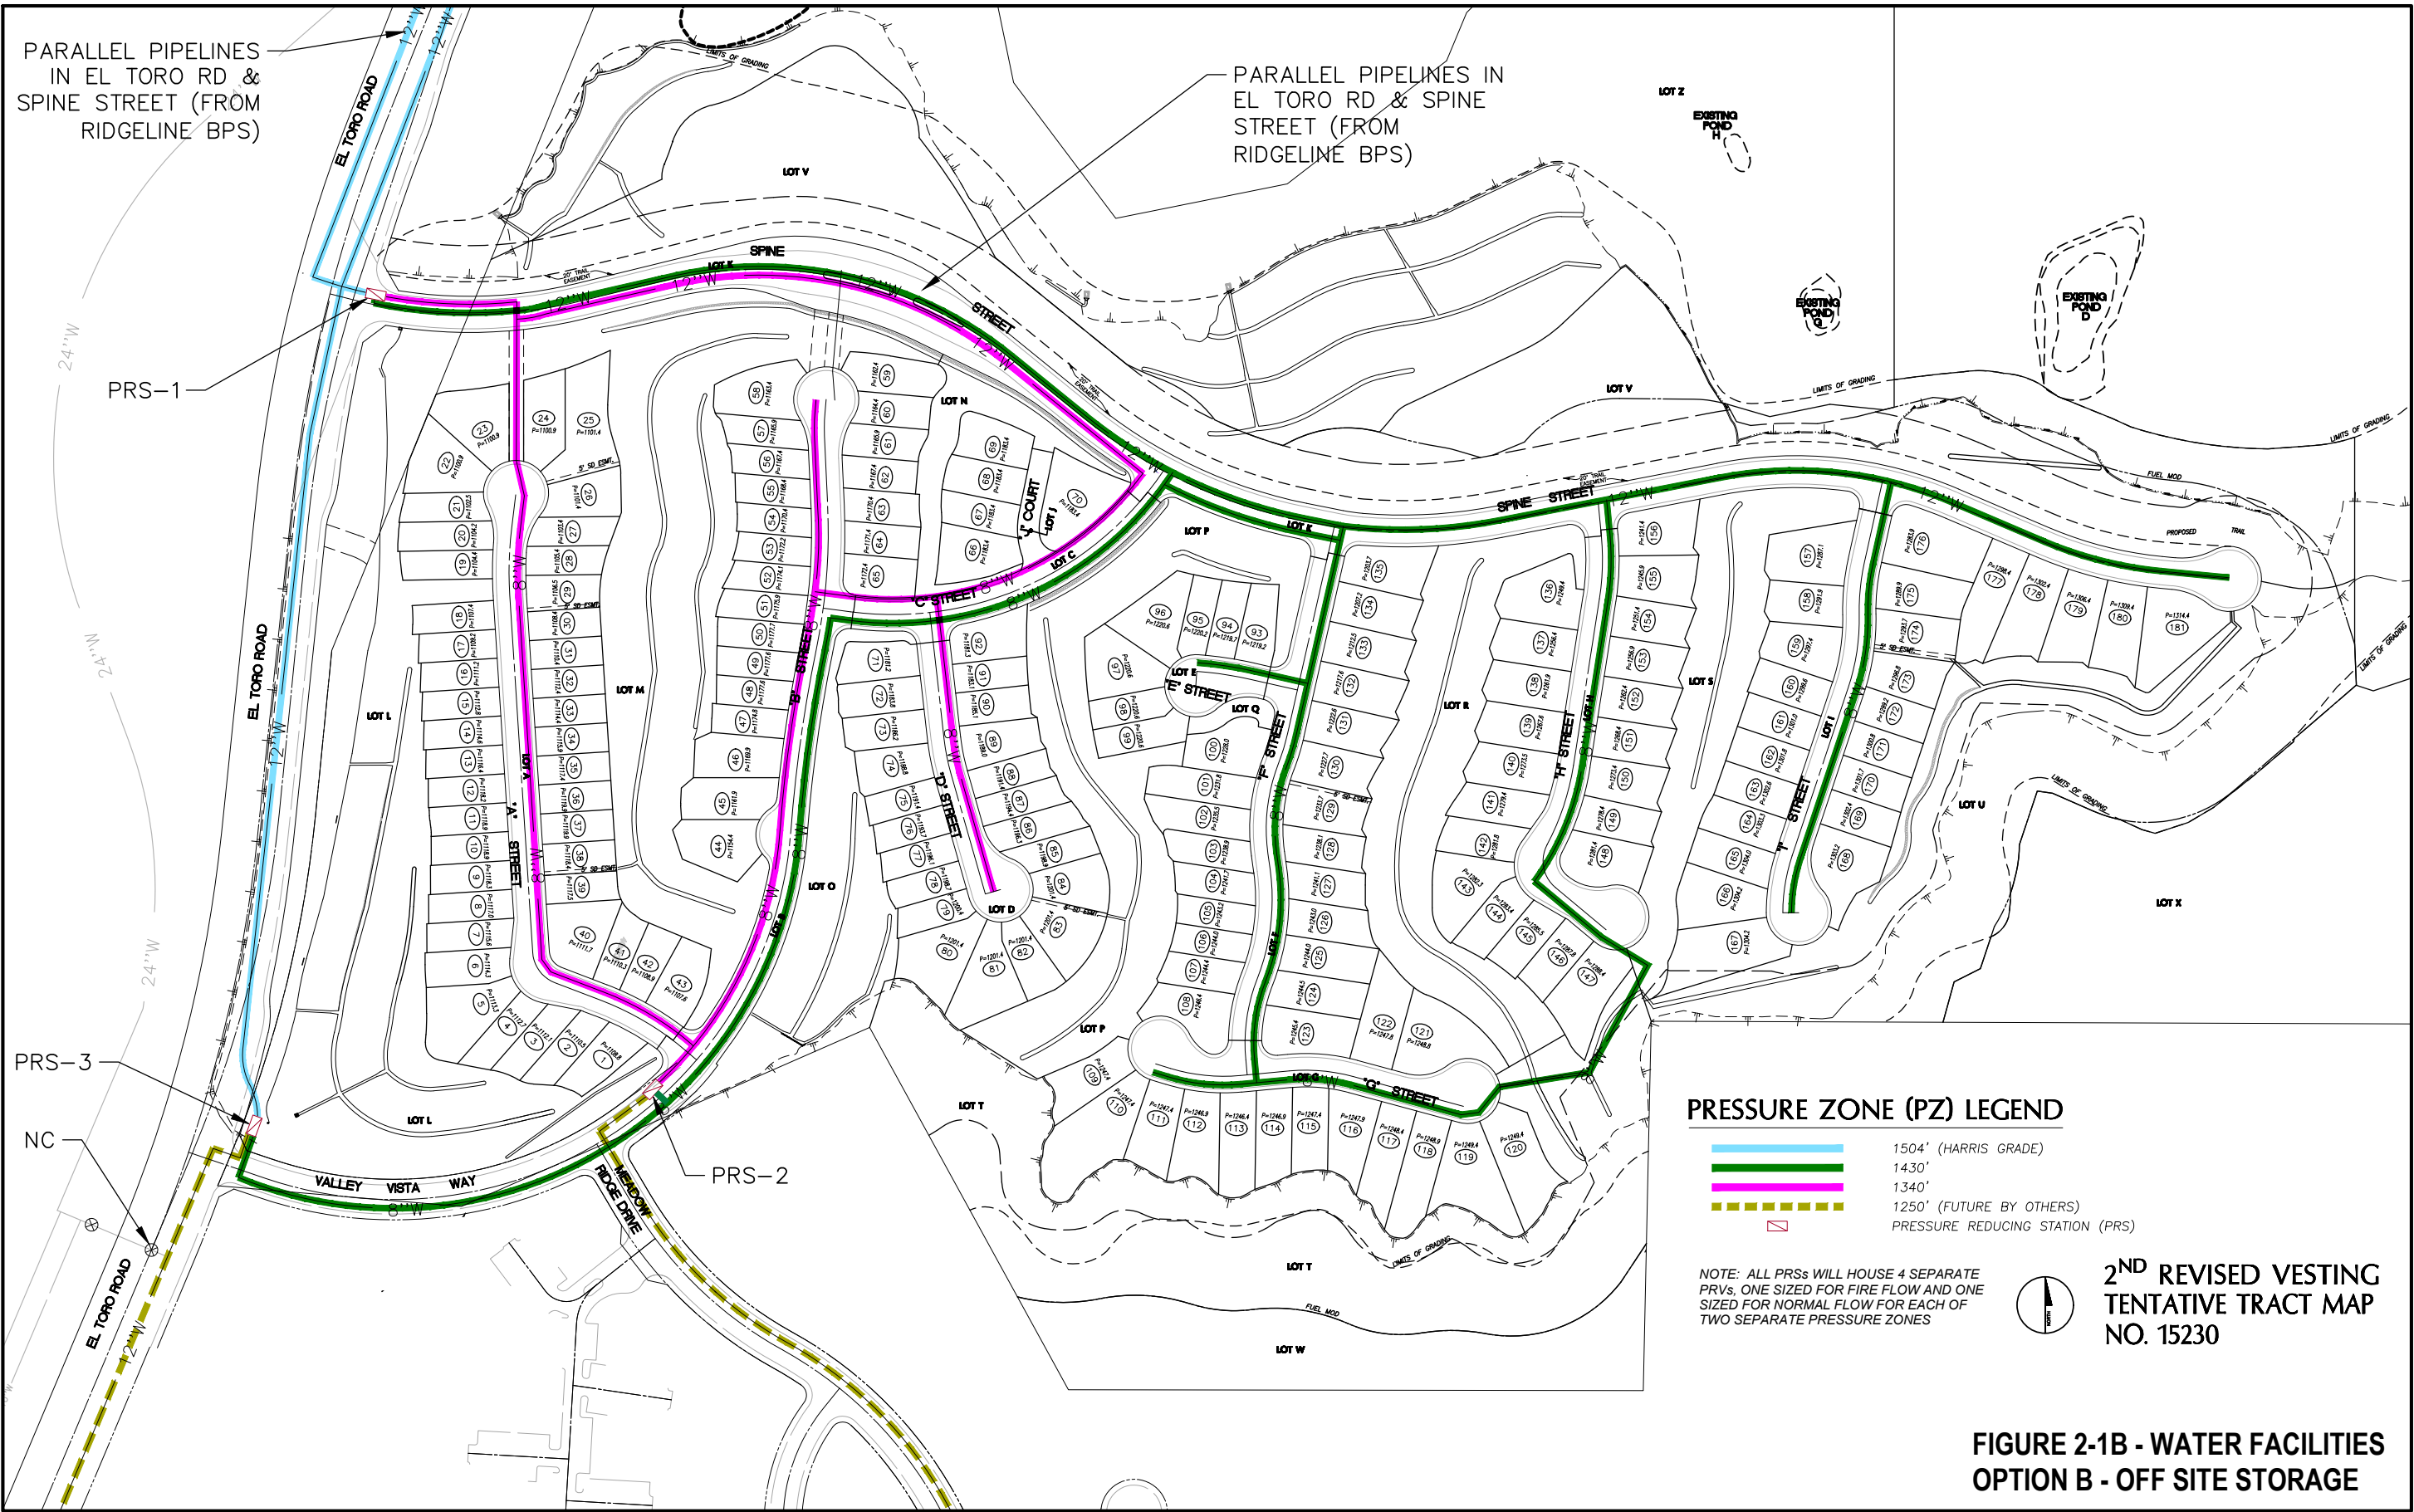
B - WATER FACILITIES OPTION B - OFF SITE STORAGE
